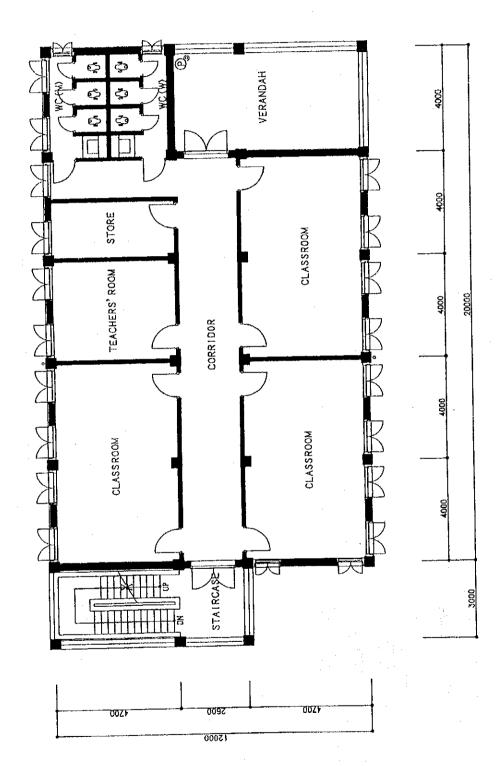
(2) FIRST FLOOR PLAN (3-CLASROOM TYPE)
